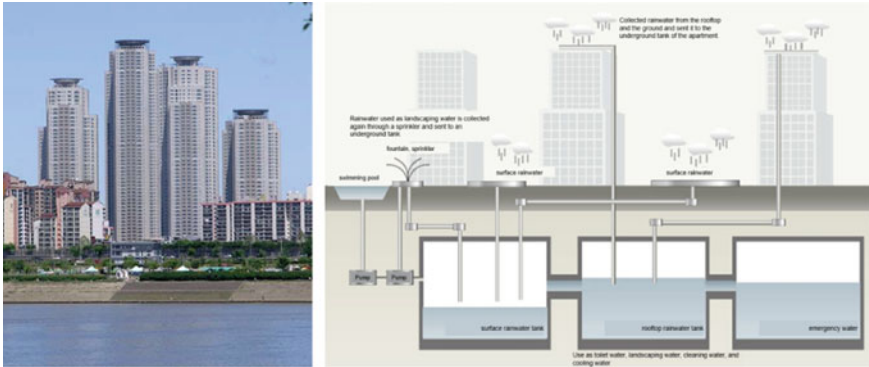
Rainwater use in Star City Building [7, 8]. *Source* Building Korea and Joins.com
